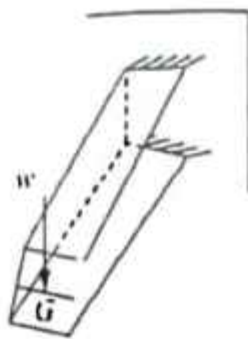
(a): Twisting of channel subjected to load through centroid.
